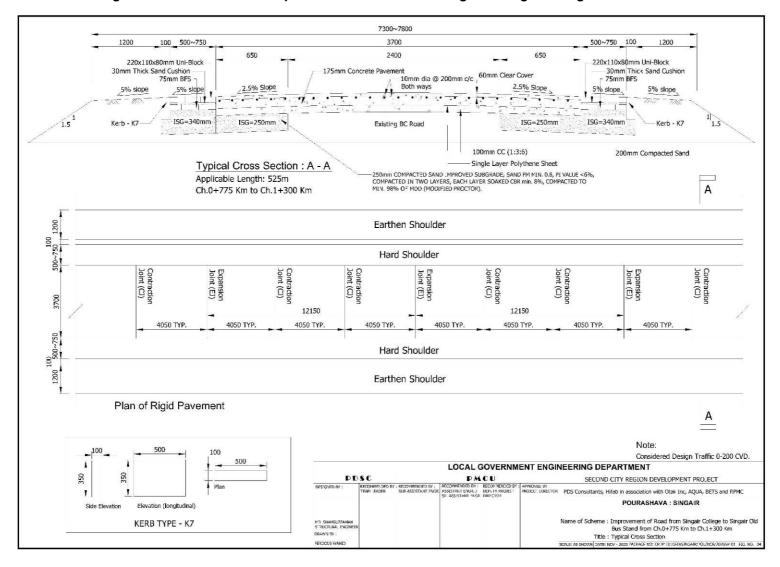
Cross section of Construction of drain from Singair College to Singair Old Bus Stand
